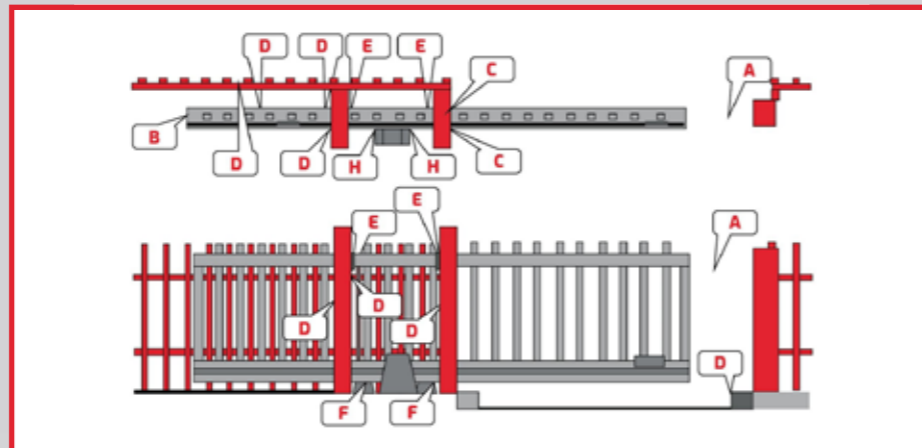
Elevation and plan view of an automatic cantilever sliding gate.
